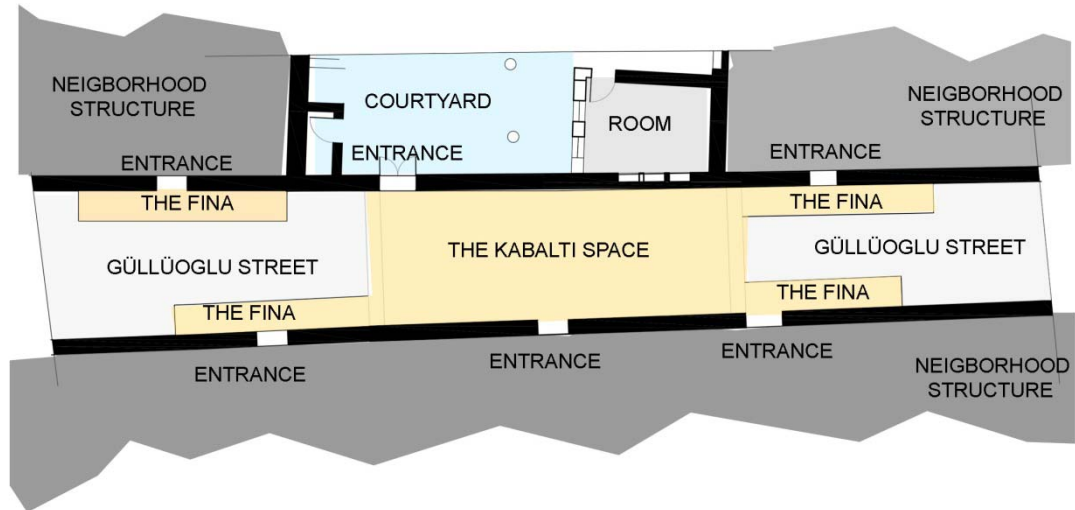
Zoning of the ground floor plan of Kurtulus Kabaltı House
